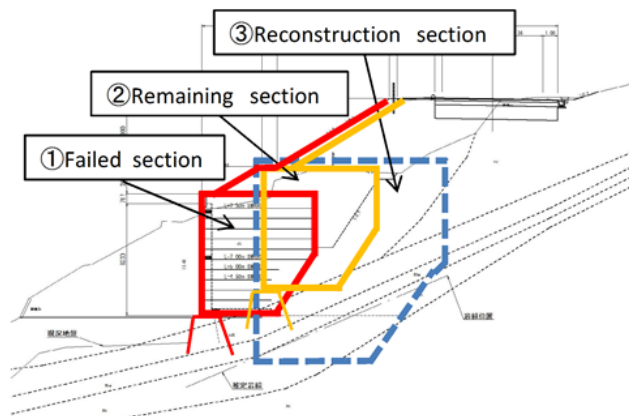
Cross sections of failed, remaining and reconstruction of reinforced soil wall
